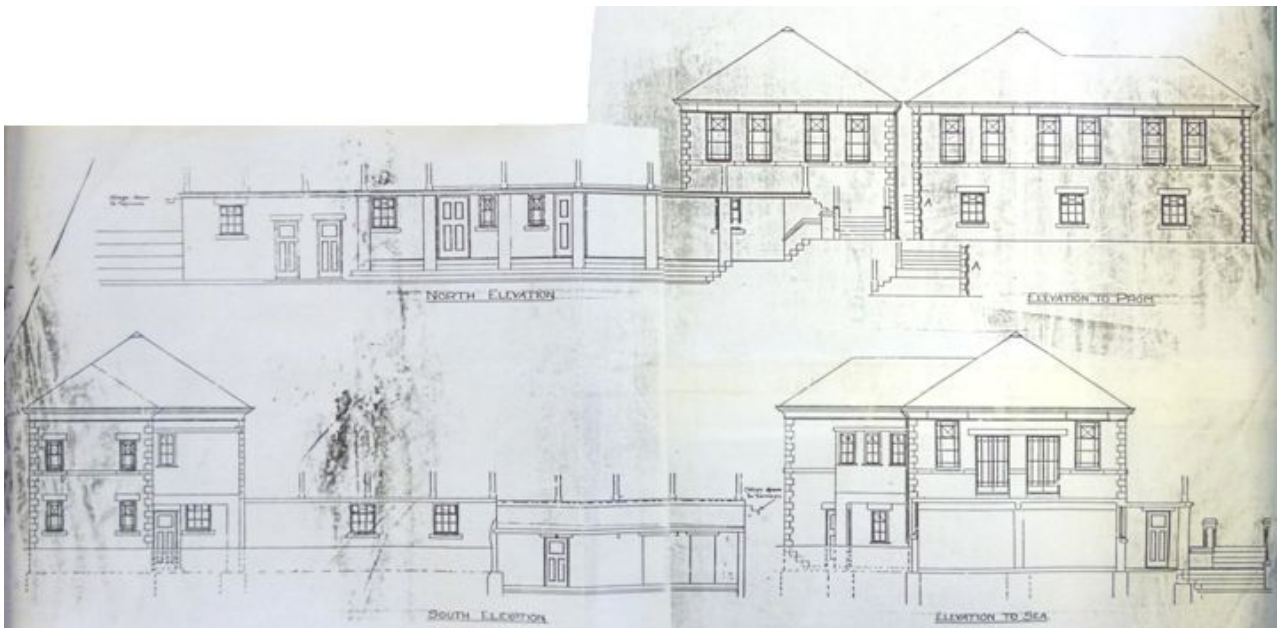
(right): Elevations of the south building, c1975 (NPS Archives)
